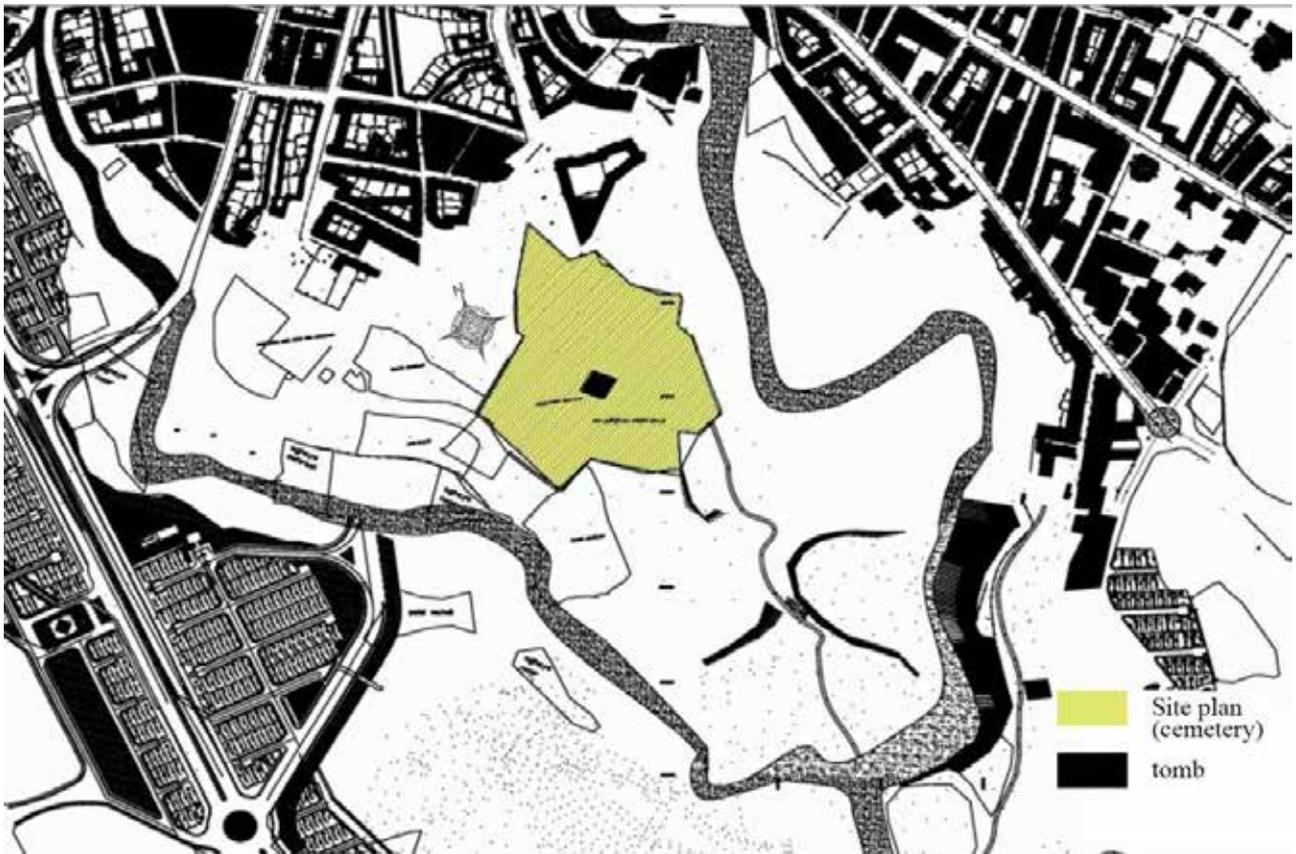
Imamzadeh Seyed Salahuddin Mohammad (AS) Plan Site. Source: Authors.
